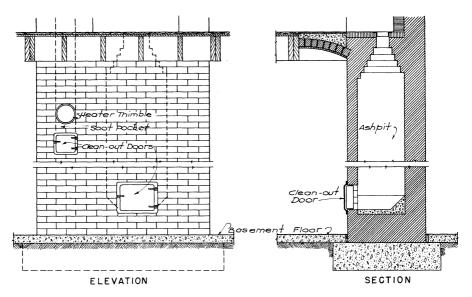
An ashpit for a fireplace should be of tight masonry and should be provided with a tightly fitting iron cleanout door and frame 10 inches high and 12 inches wide. The left-hand drawing also shows a cleanout for a furnace flue.
